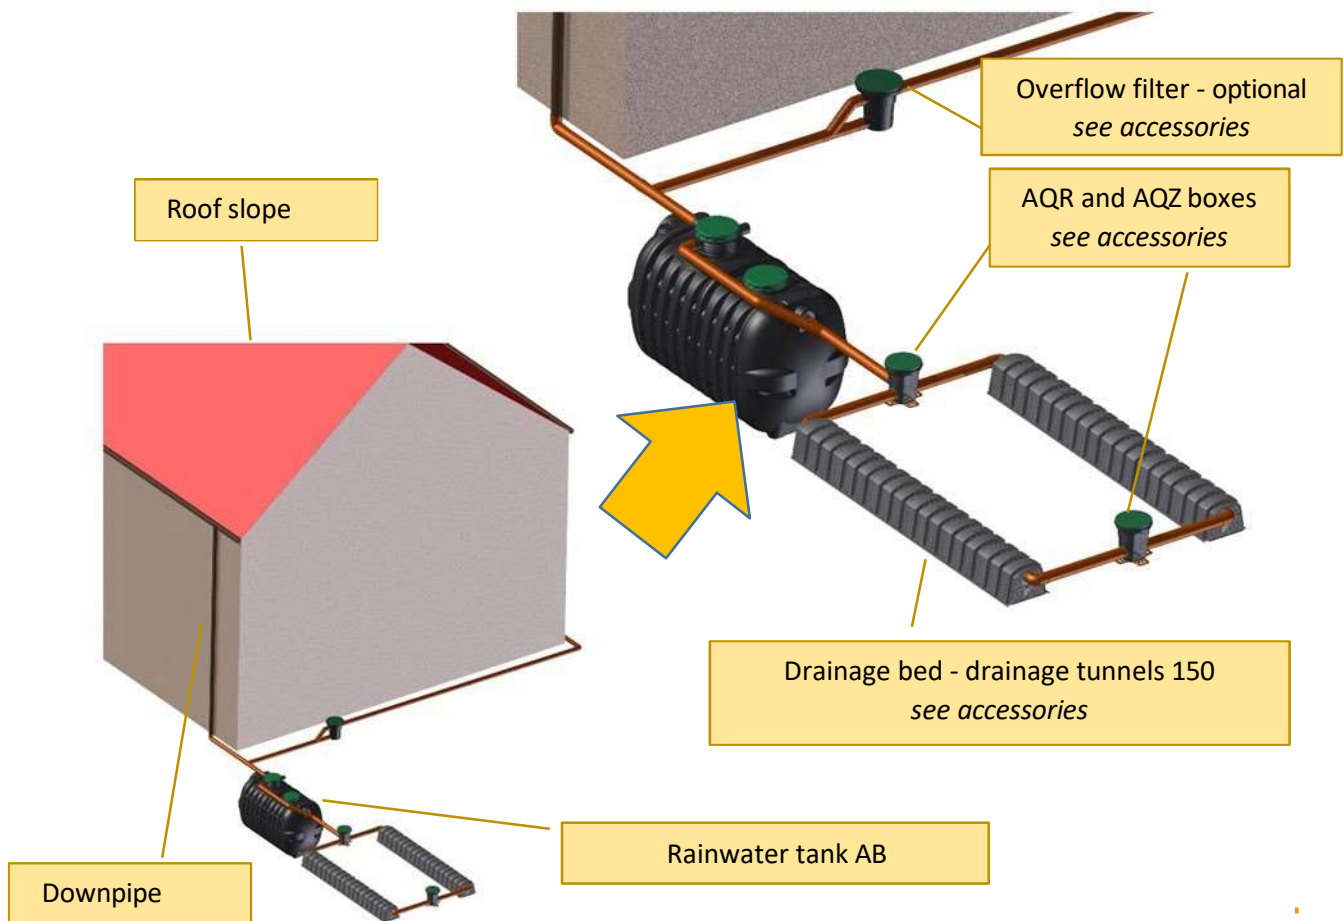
Installation of an AB rainwater tank with infiltration bed and optional overflow filter at a detached house with a roof slope greater than 150m²
